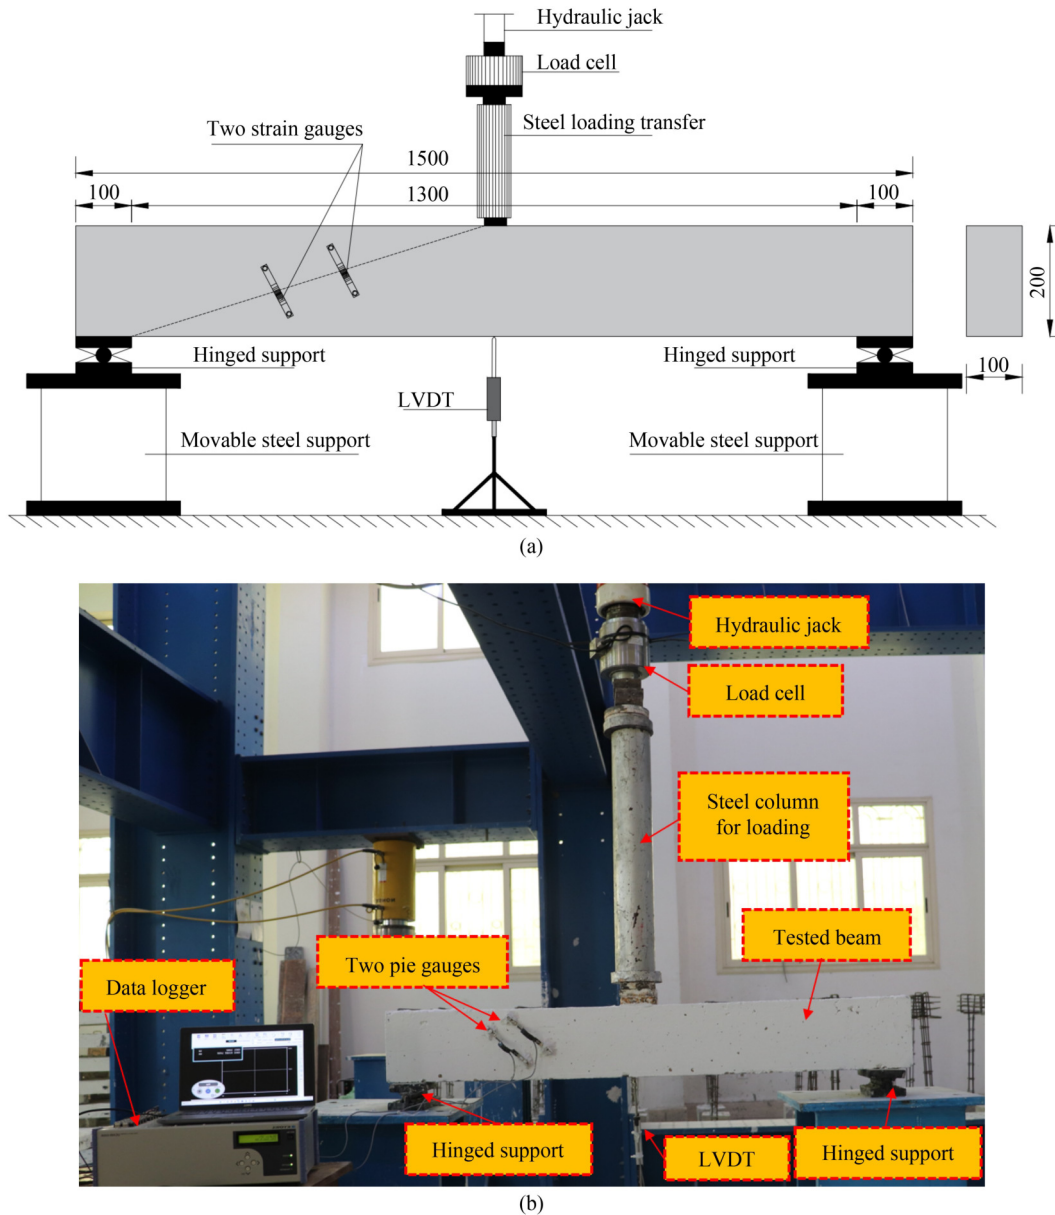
Test arrangement and instrumentations (unit: mm): (a) schematic drawing; (b) actual test.
